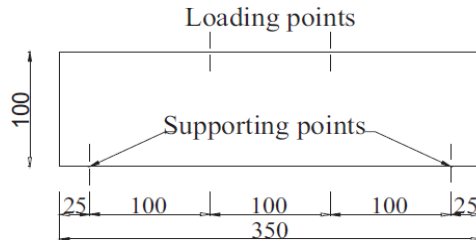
Sketch of the beam used in the four-point bending test (dimensions: mm)
